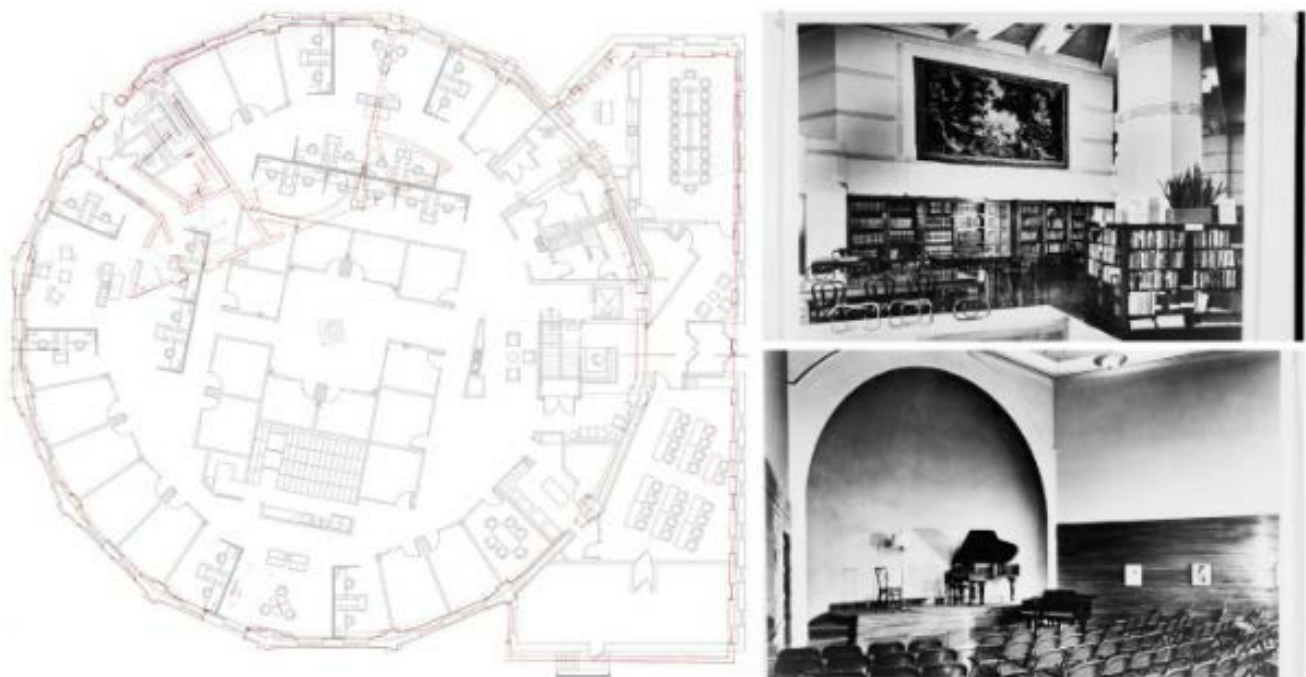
In red, the floorplan of the Grosvenor Library Reading Room circa 1957. In black, Lumsden McCormick's floor plan circa 2012.
